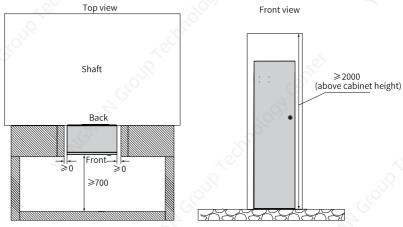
Mounting clearance requirements of the MRL control cabinet (Unit: mm)
